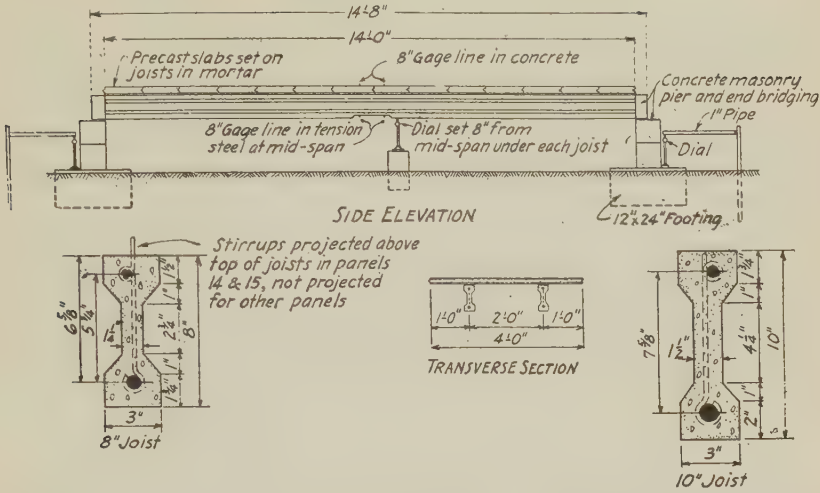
PRINCIPAL DETAILS OF TYPICAL PANEL AND JOIST SECTIONS
